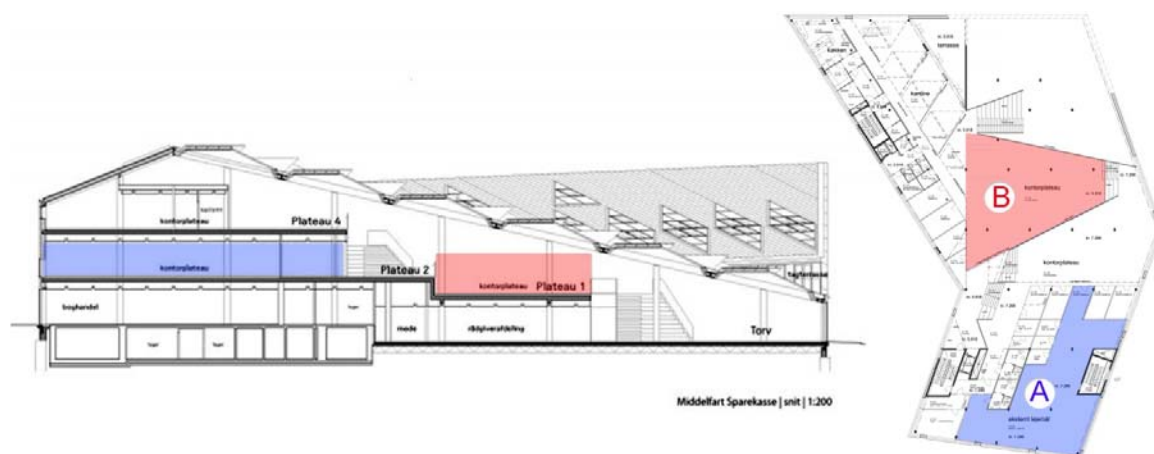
Case study building (vertical and horizontal sections). In evidence the two analyzed rooms located at the first floor (Room A and Room B).
